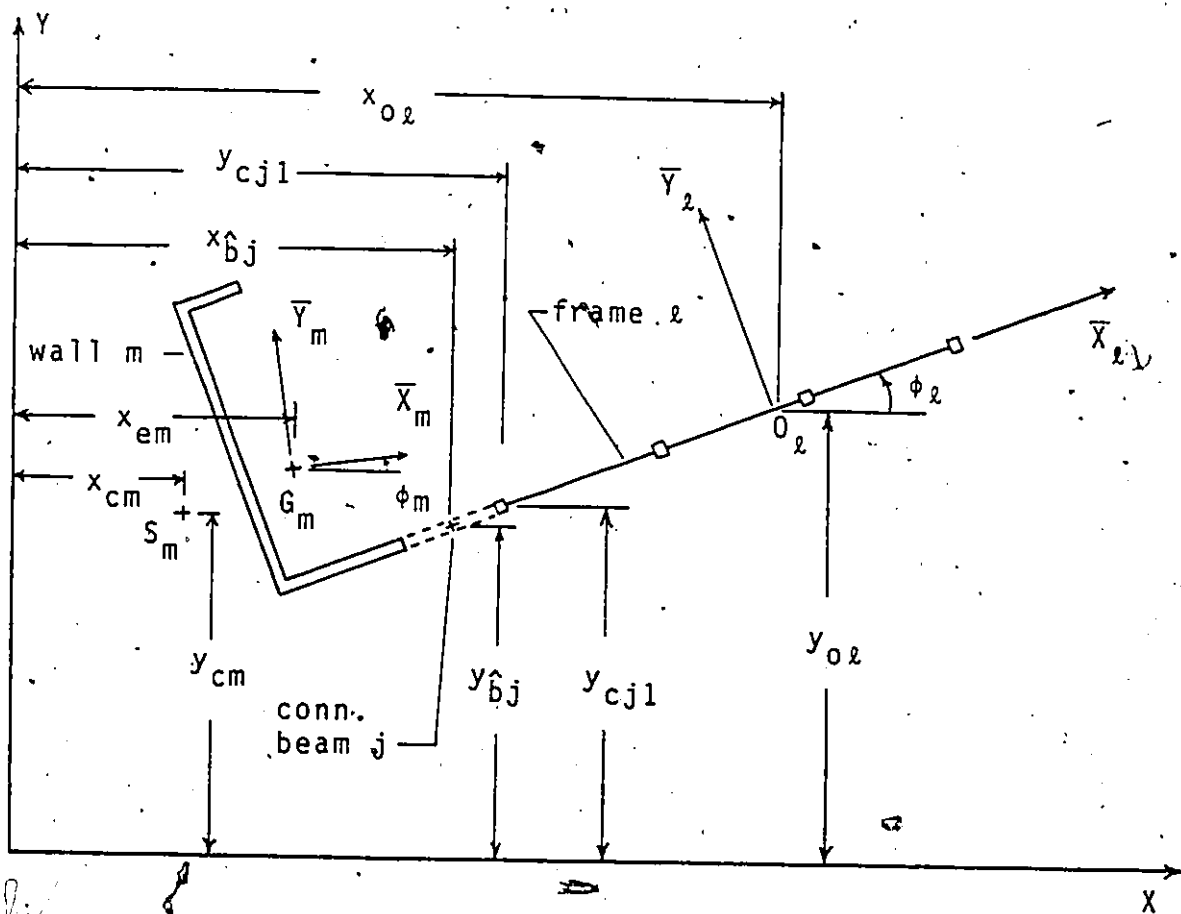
COUPLING BY TYPE 3 CONNECTING BEAMS
